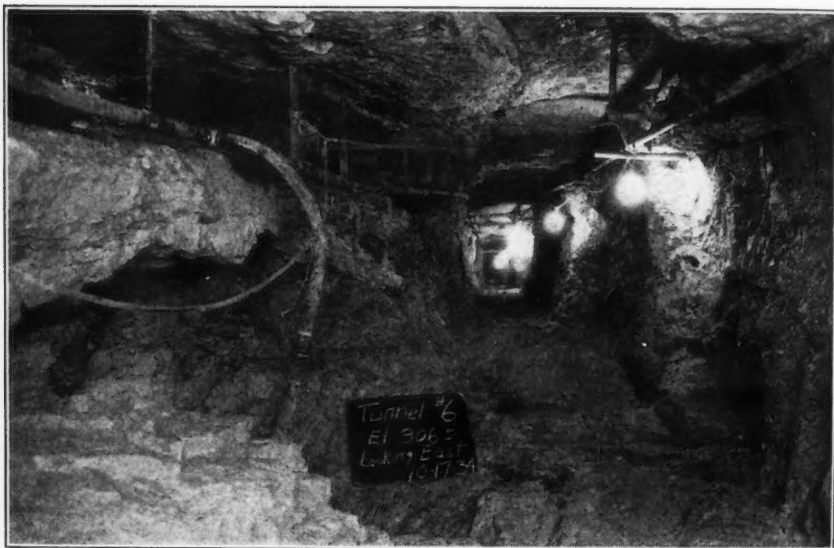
VIEW IN TUNNEL SHOWING GROUT PIPES AND LARGE SEAM
